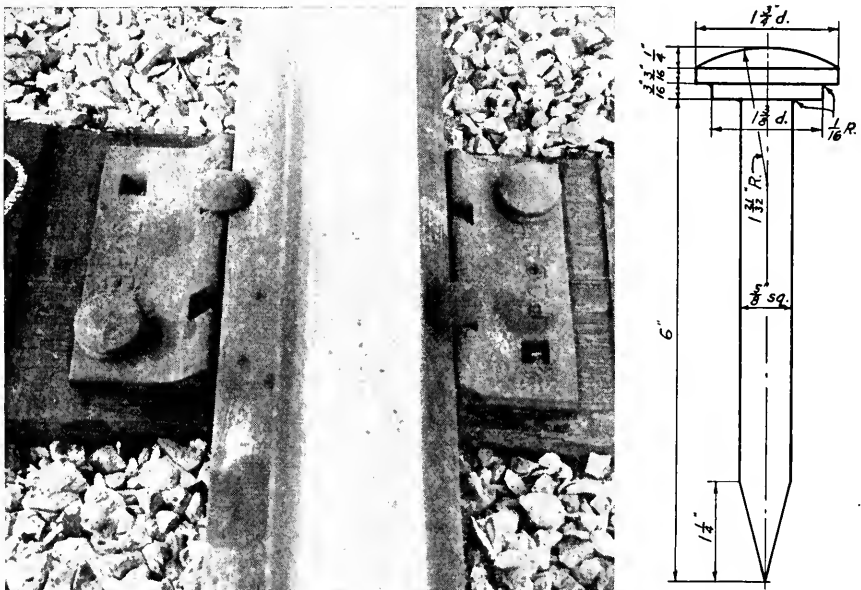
Section 11, $2\frac{7}{8}$ in. by $7\frac{3}{4}$ in. Round Head Dowel Studs with Double Coil Helical (Experimental) Spring Washers.
